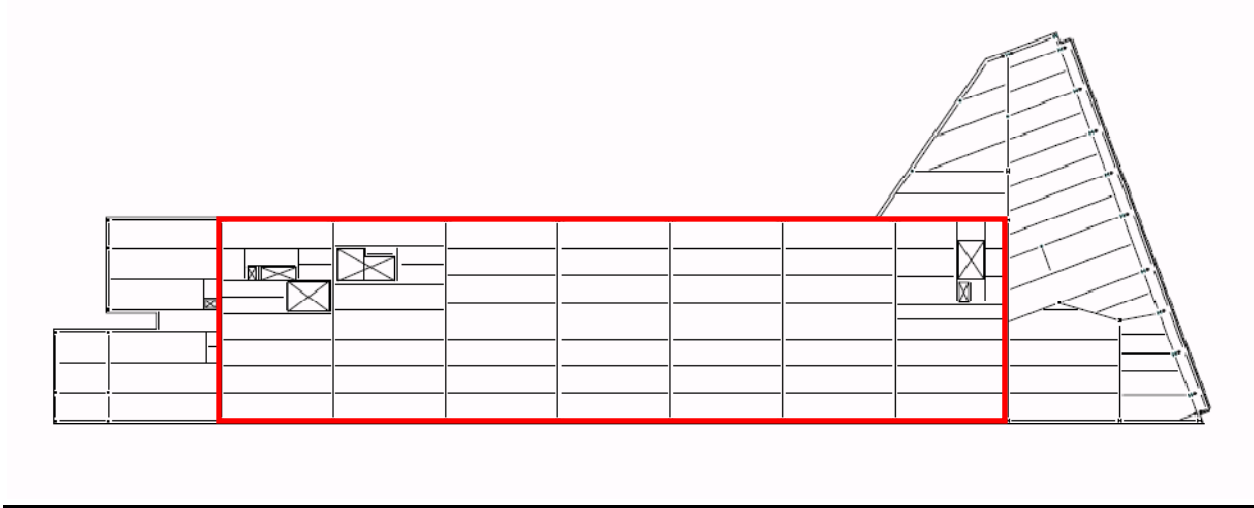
Extent of Lateral Structure on Typical Floor Plan
